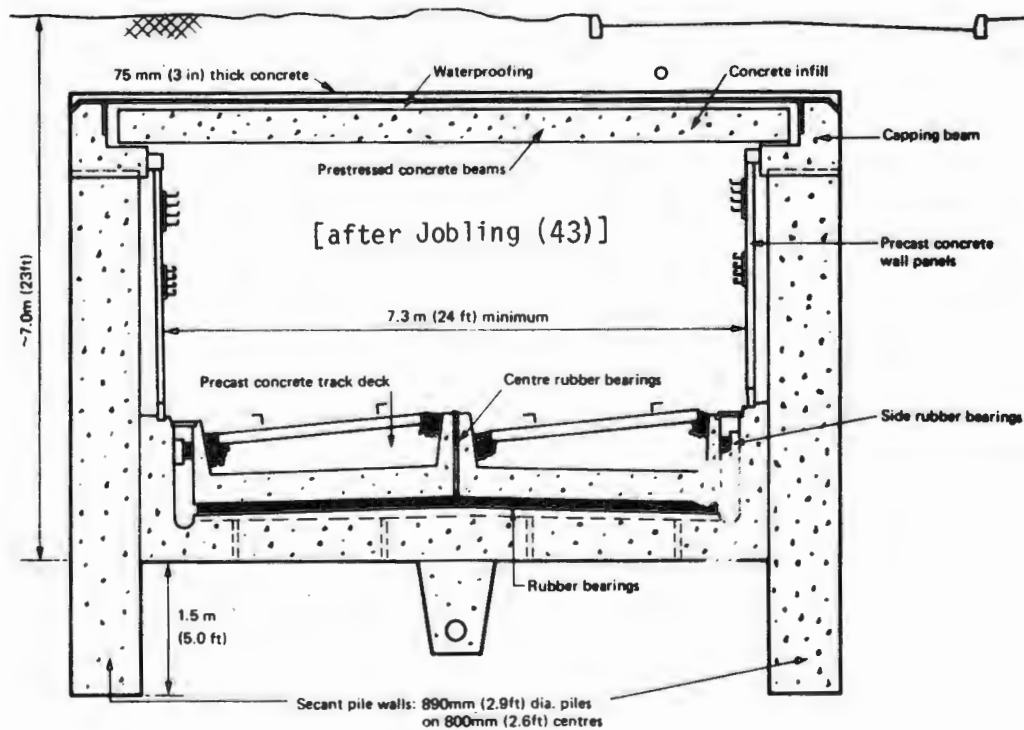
Cross-Section of Metro Structure with Secant Pile Walls
